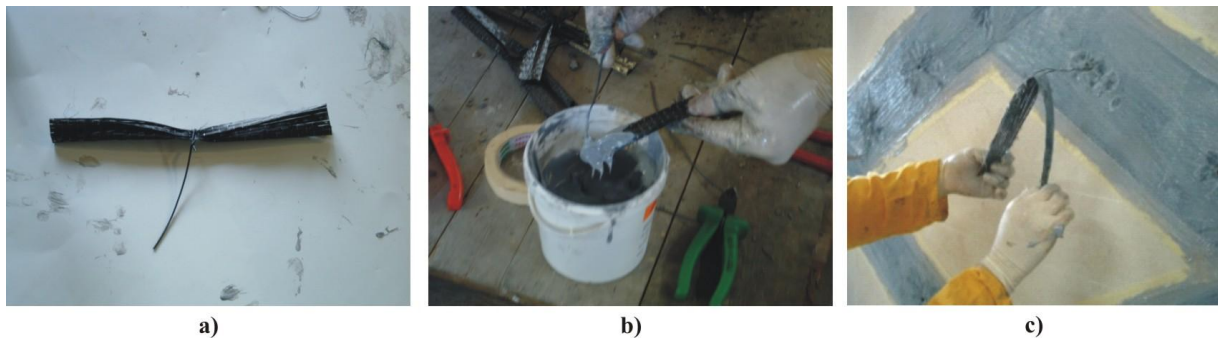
Application of FRP anchor dowels: a) close-up view; b) epoxy saturation of anchor dowel; c) FRP anchor dowels placement in brick infills (after Akguzel [6])
